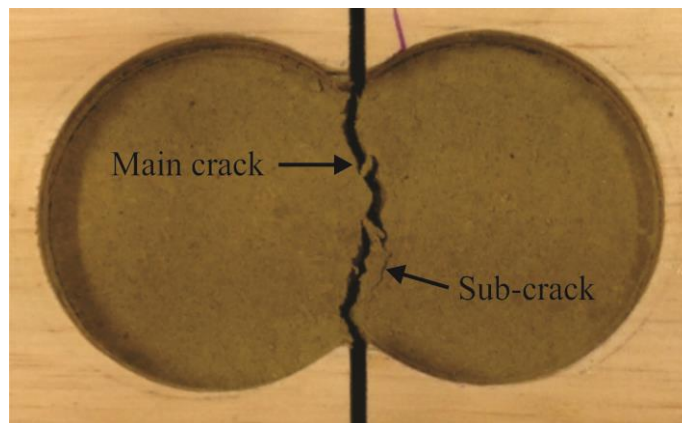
Failed tensile test specimen showing subsidiary ('sub') crack and main crack.
